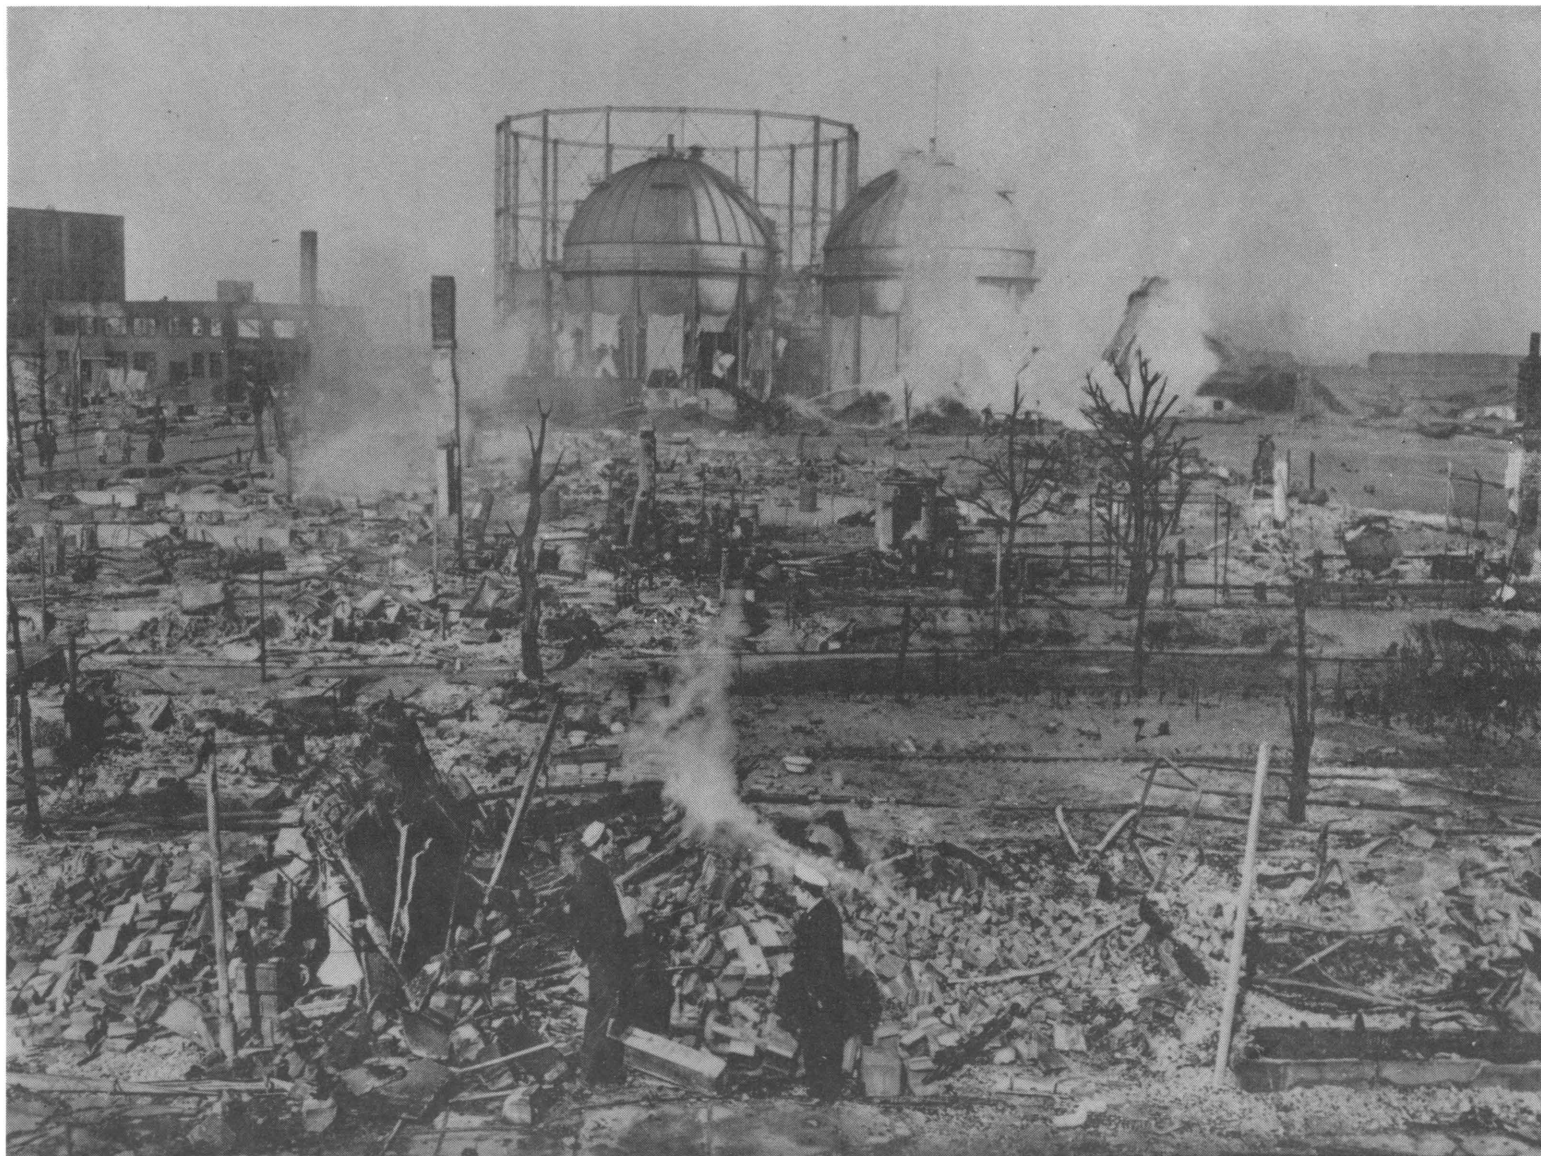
Damage in the vicinity of the LS & R plant, East Ohio Gas Co., looking toward the northwest and showing remains of dwellings on the east side of East 61st Street.
